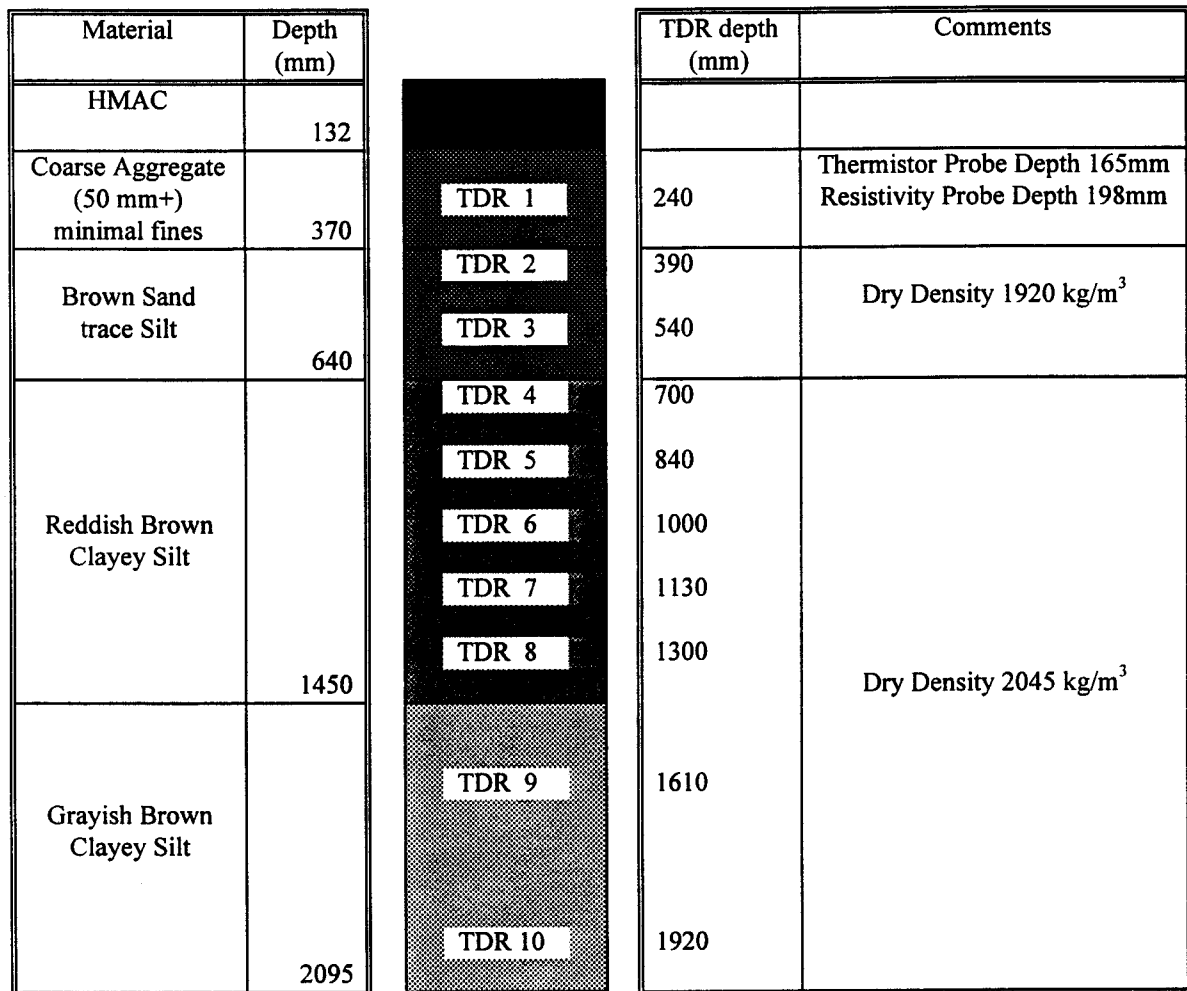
Profile of Pavement Structure and Probe Depths, Station 0-12
